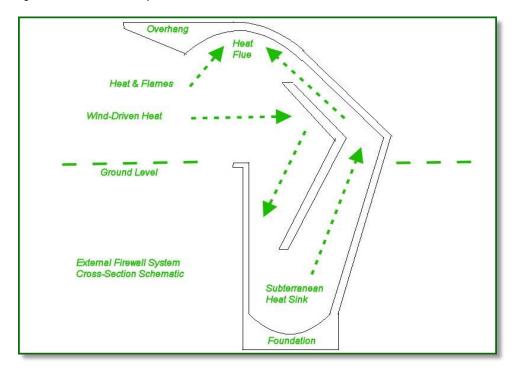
External Firewall System Lithoshield Cross-Section Schematic
